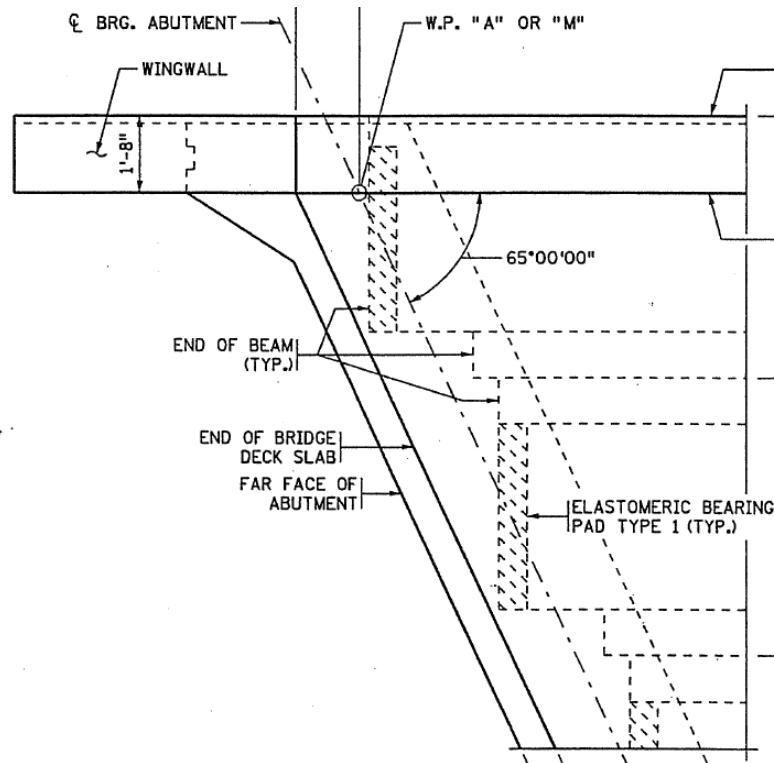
Placement of precast slab span panels at a skewed support
